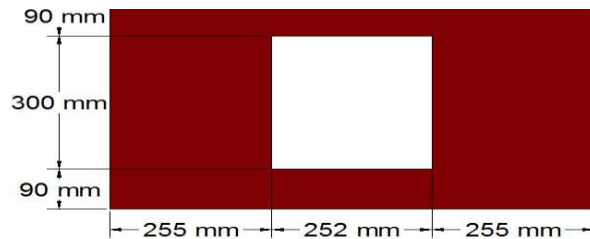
(d) Masonry wall with opening at the center of size 252×252
